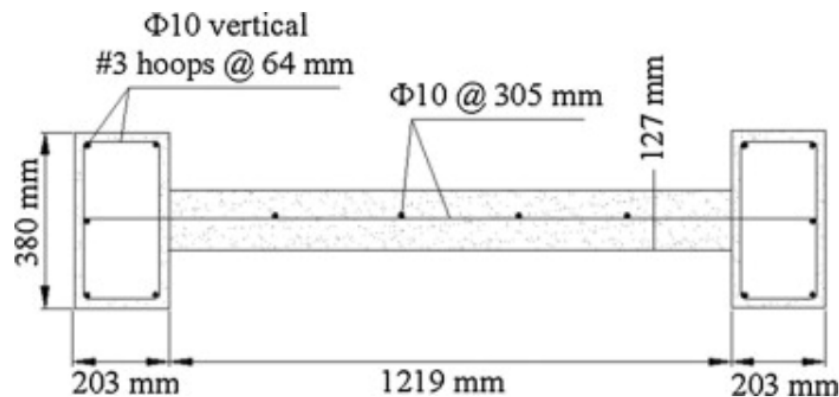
Perry et al. Wall Designed with Strength Approach [21]
